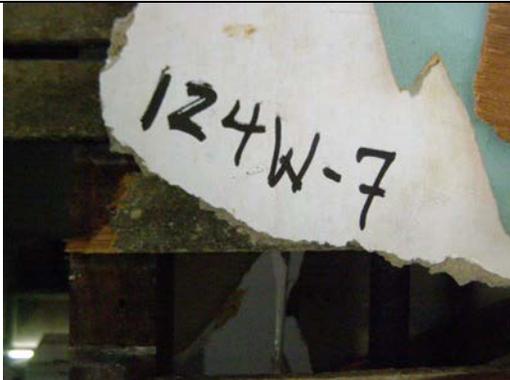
Plaster (124W-7) Landing to 2<sup>nd</sup> Floor, Wall B.
